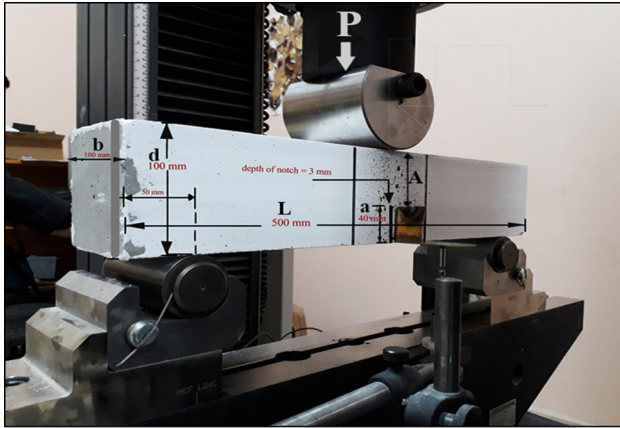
Test set-up and detail of specimen under three-point bending loading.
